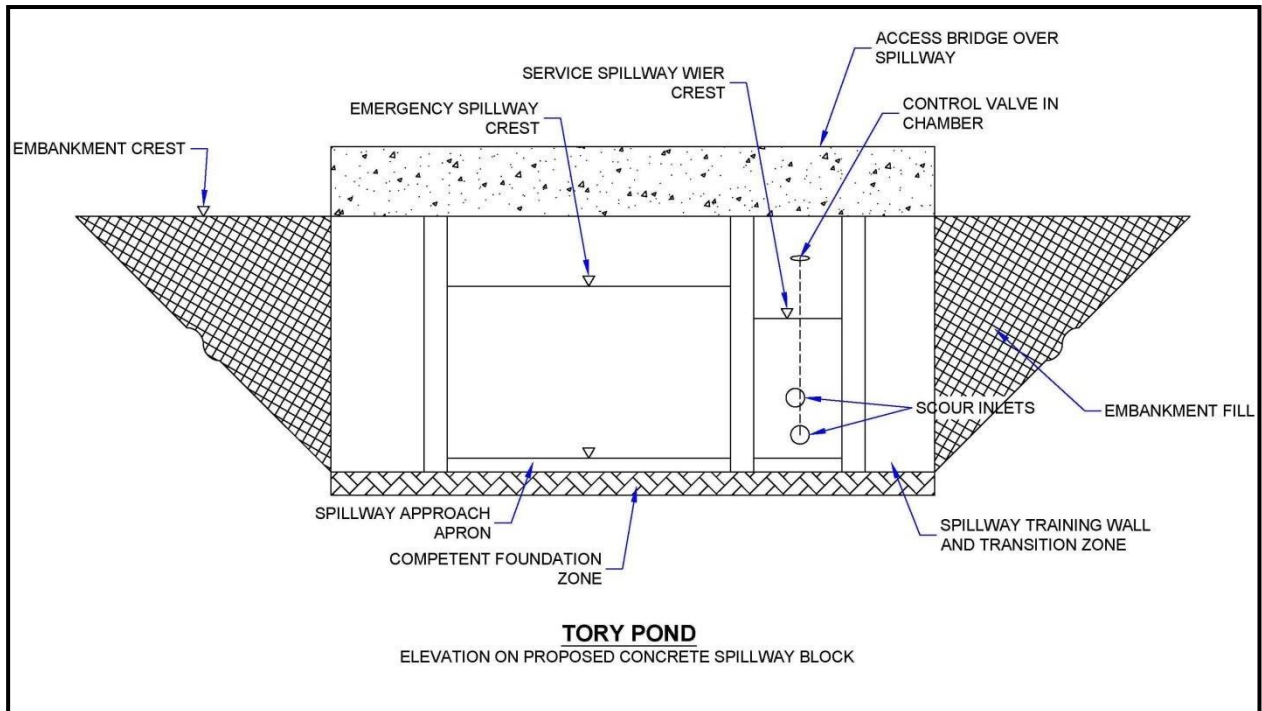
Tory Pond conceptual elevation on embankment/spillway
